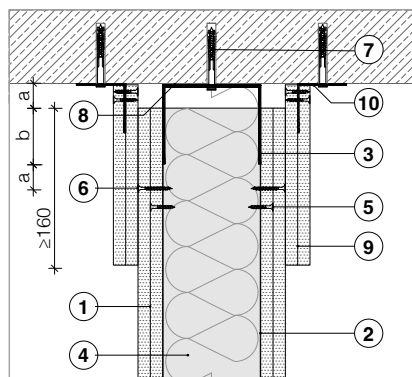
Connecting a partition wall ( $h > 6.5$  m) – variant 2 (with plasterboard "curtains")
